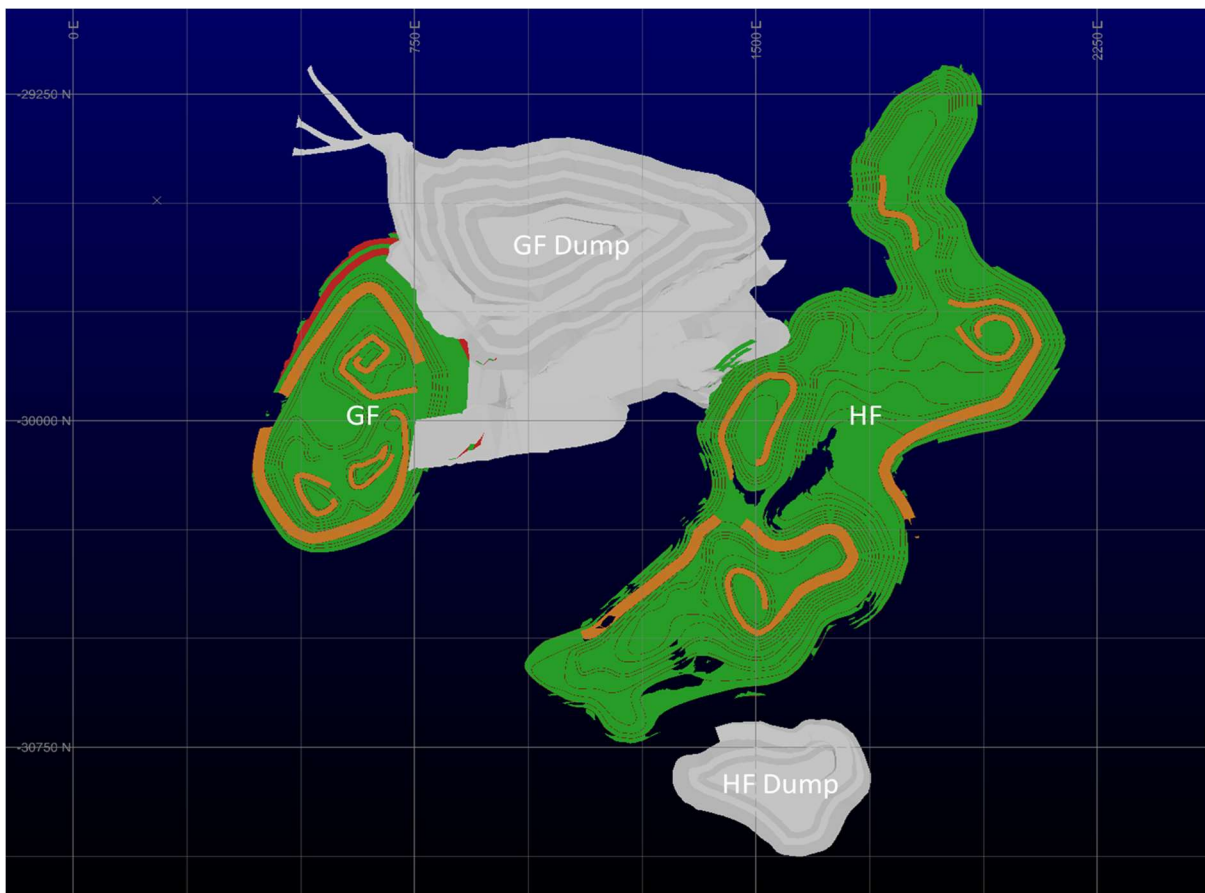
GF and HF Waste Rock Dump (WRD) Designs - Plan view
